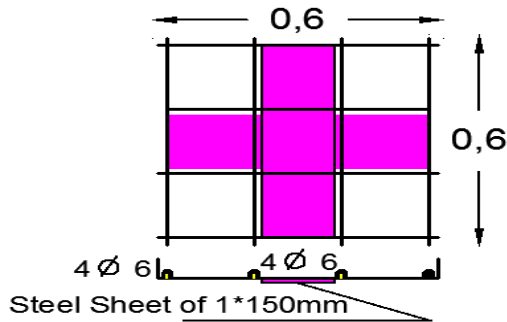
Slab with Reinforcement 4Ø6 mm steel bars and strengthened with 3Ø6
